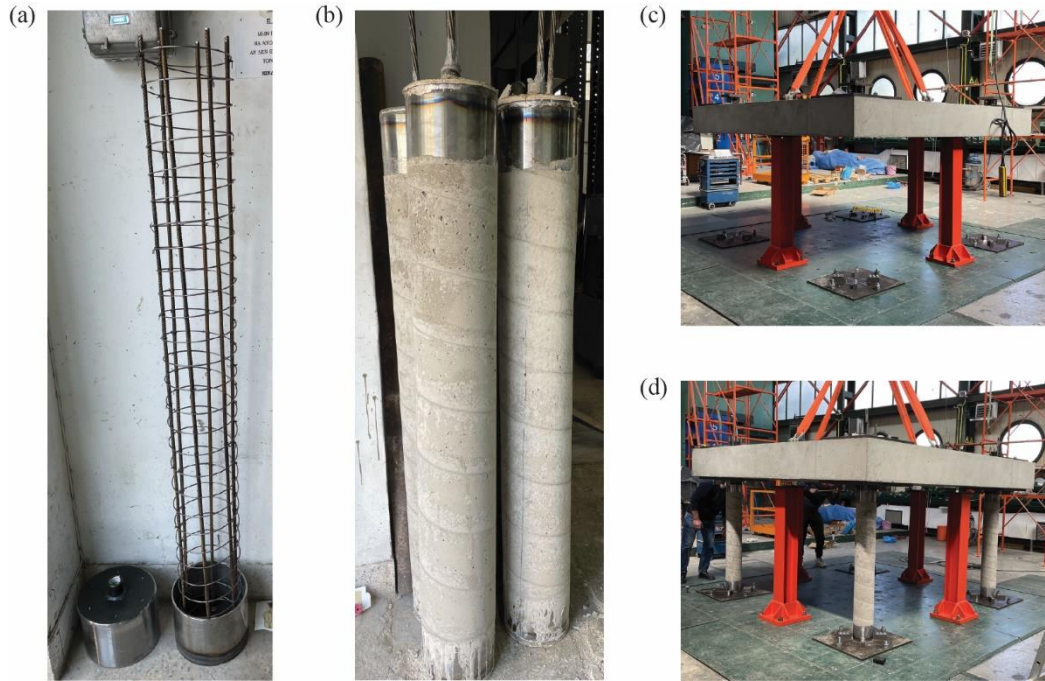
a-d shows key stages of the construction process. The steel jackets were fabricated in a workshop and the reinforcement was welded to them. The spiral was placed by hand, the tendon was screwed to the bottom threaded tube, and a steel duct was welded around the threaded tube. The columns were cast in the LRC of NTUA using carton formwork and 48 days after casting, when the concrete had developed an average compressive strength of  $47.6 \pm 2.4$  MPa, the columns were placed on the shake table, and the slab was placed on top with a crane. Then, the spring stack was placed and the top nut was screwed at the top end of the tendon. Safety steel columns (in red in Figure 6.11c,d) were installed on the shake table to prevent crashing of the slab onto the shake table, in case of specimen collapse. A minimal prestress of 2 kN was applied to the columns to ensure that they are not loose.
